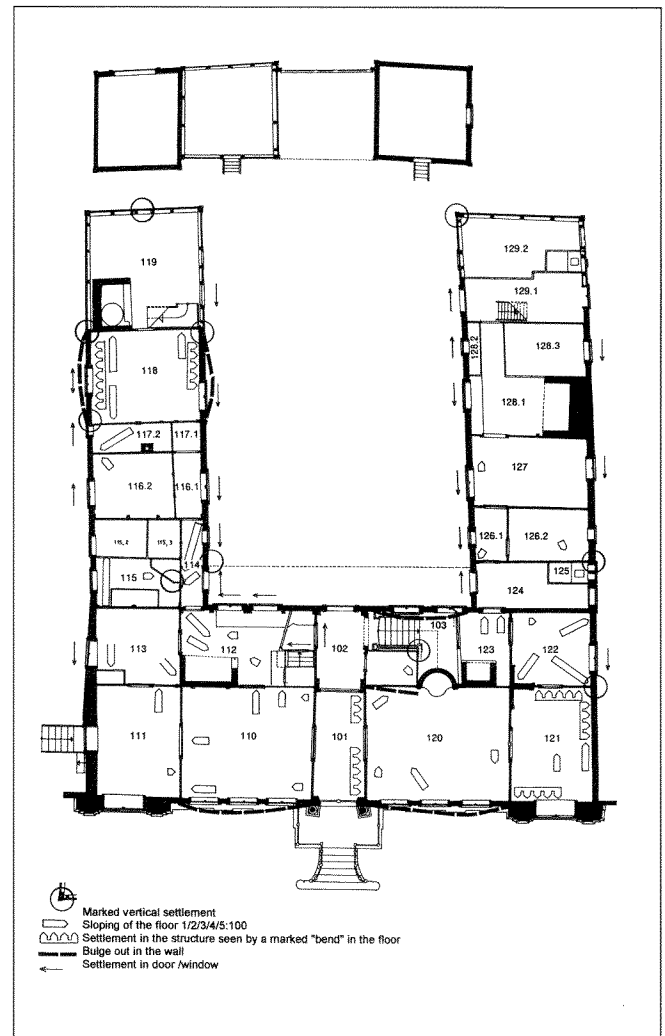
Plan. Ground floor. Assessment of structural weaknesses in the building before restoration. Photo: Arkitektene Hansteen A/S.
